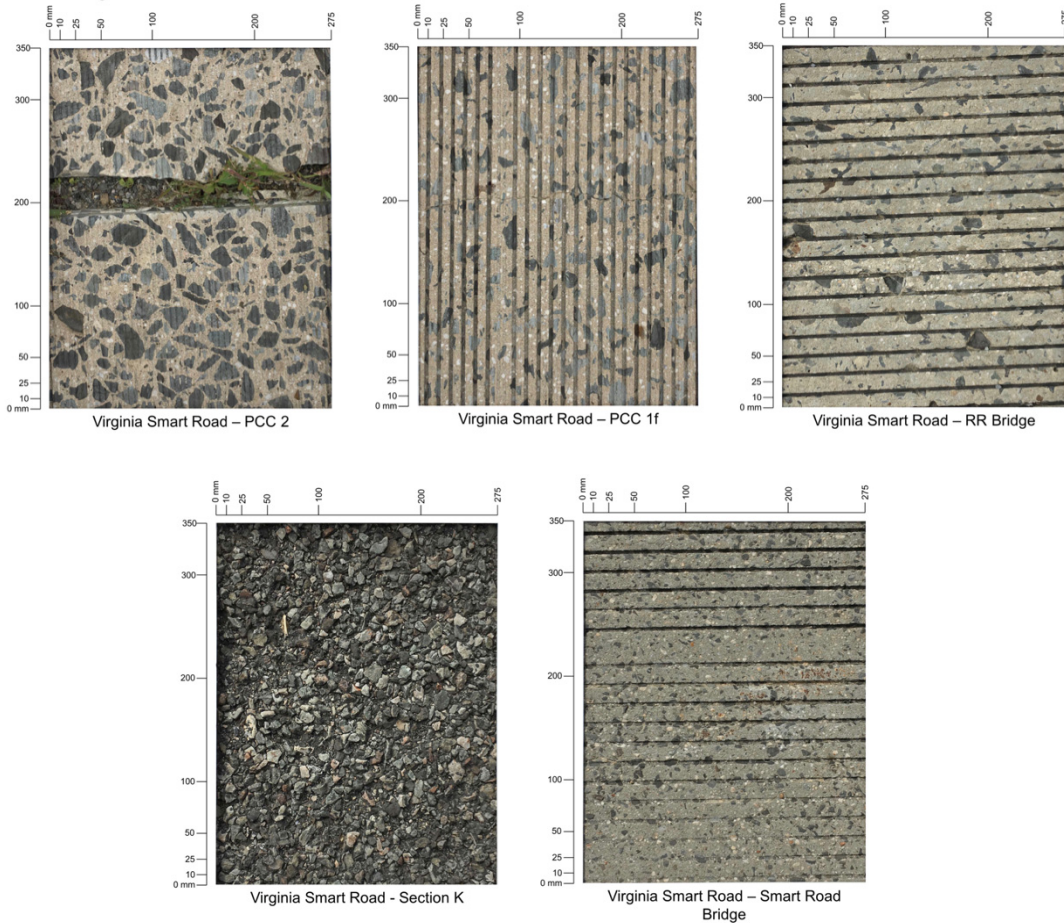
Virginia Smart Road Pavement Surfaces
